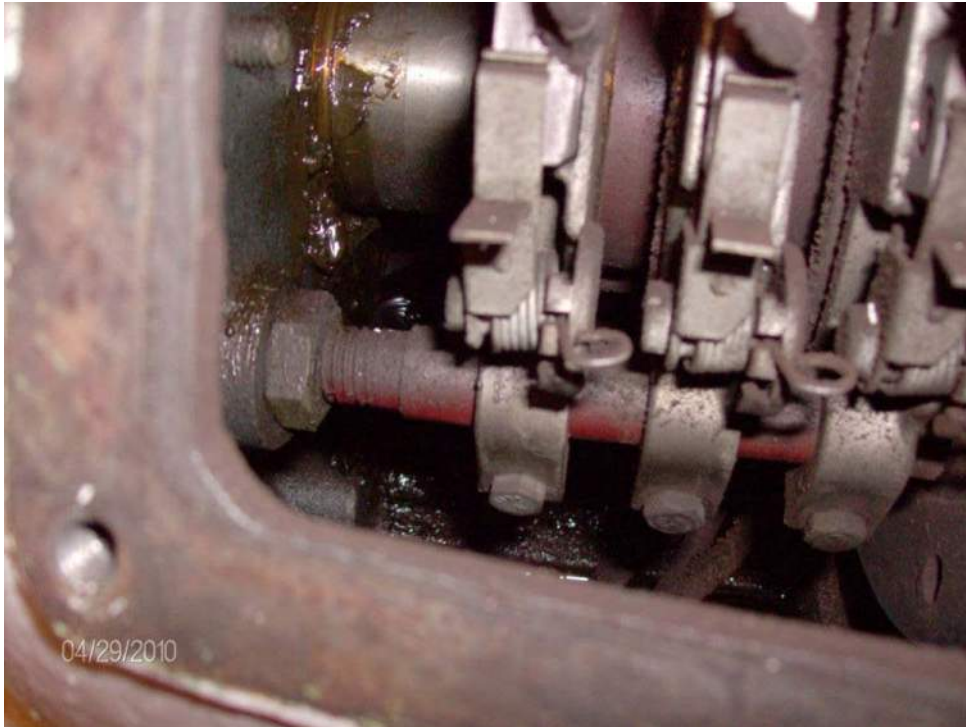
, The span drive motor interiors are contaminated with grease and oil which is leaking past the bearing seals.
